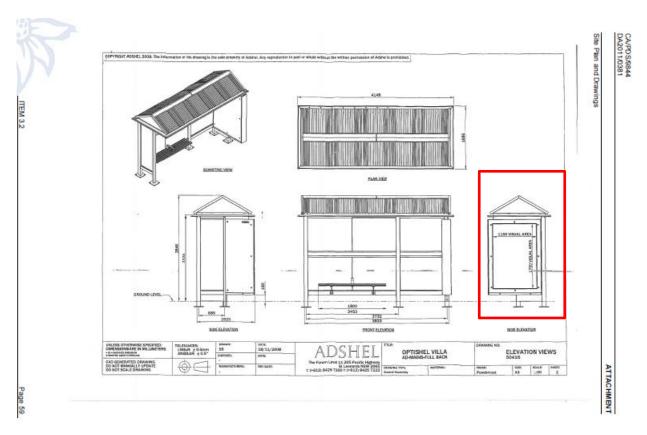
Shelter J2 DA2011/0381 Submitted Elevations (Extracted from DA2011/0381 Assessment Report)
